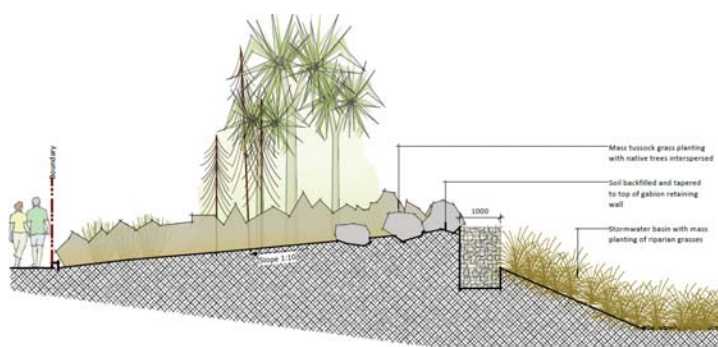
Planting along Lincoln Rolleston Road (RMM)
